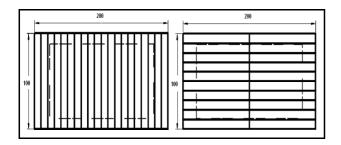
The cutting methods of casting samples and the produced specimens will subjected to 3 point bend test
